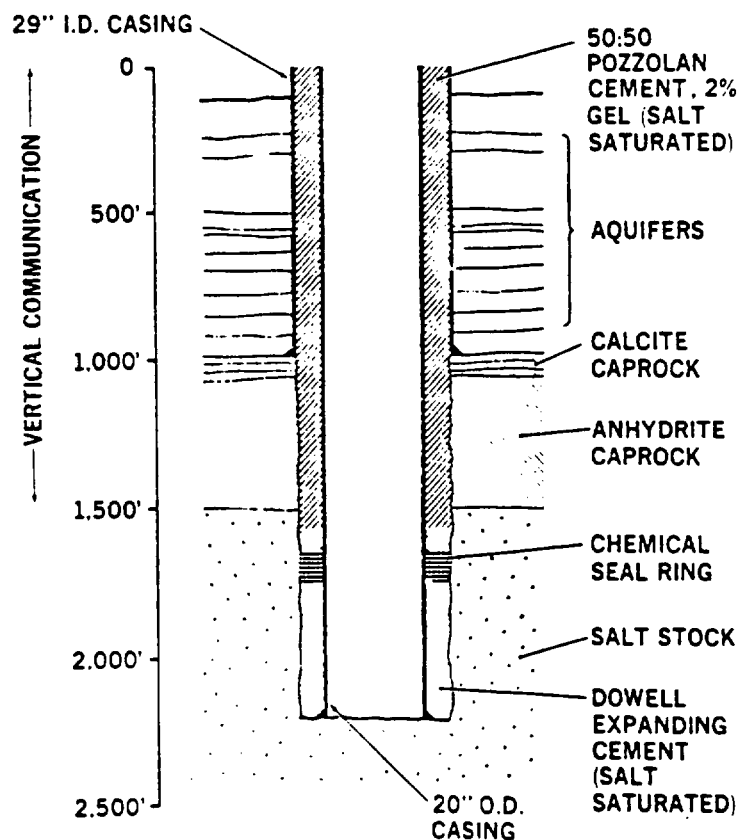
Drawing of placement technique for Dowell Chemical Seal Ring used to seal large-diameter pipe at the Tatum Salt Dome.
